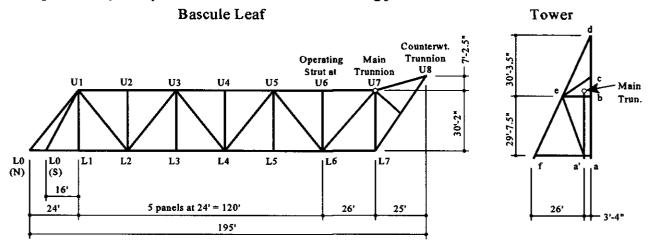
South elevation of Kinzie Street Bridge leaf and tower trusses (not to scale). Sketch by author.
